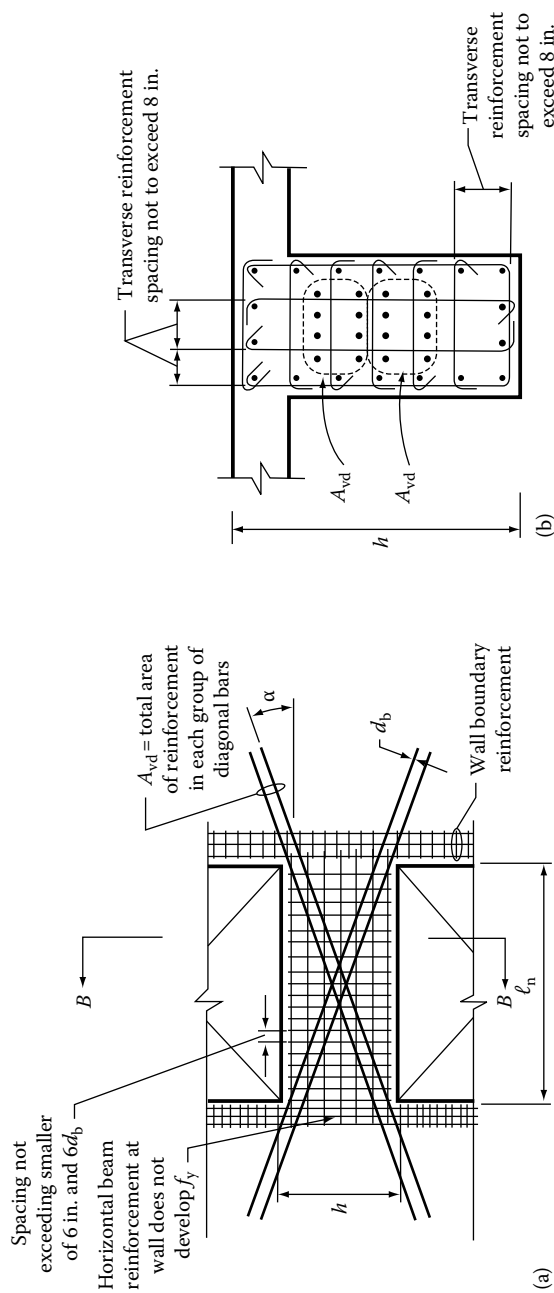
Coupling beam diagonal reinforcement. Detail 2: Full-depth confinement of diagonals: (a) elevation and (b) section.
